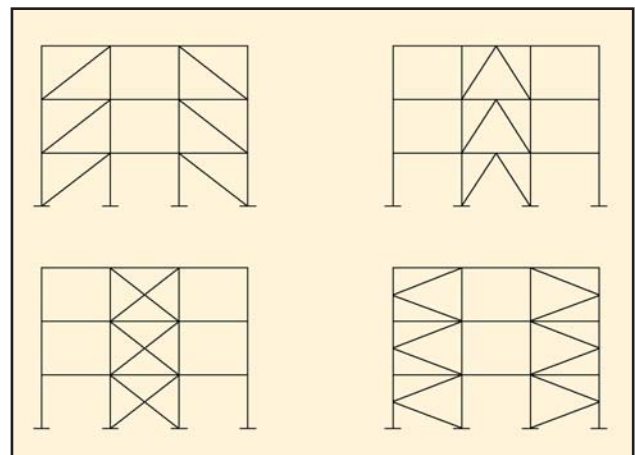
Typical configurations of concentrically-braced steel frames using hollow sections as bracings.
